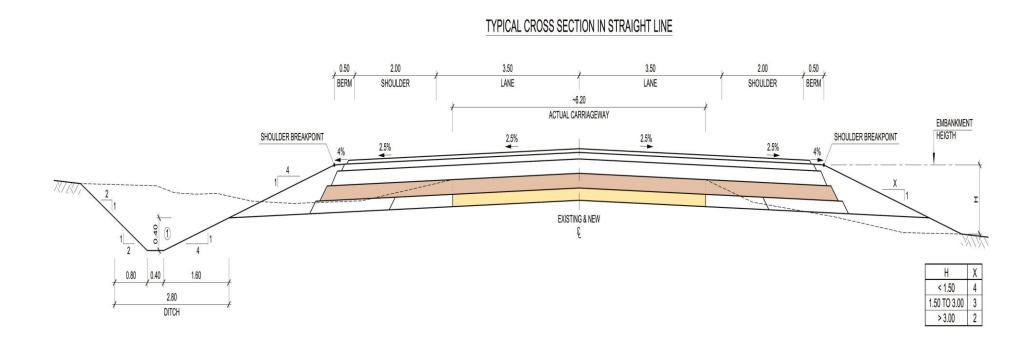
Typical Cross Section for the proposed T2 road from Mpika to Chinsali Road Rehabilitation
